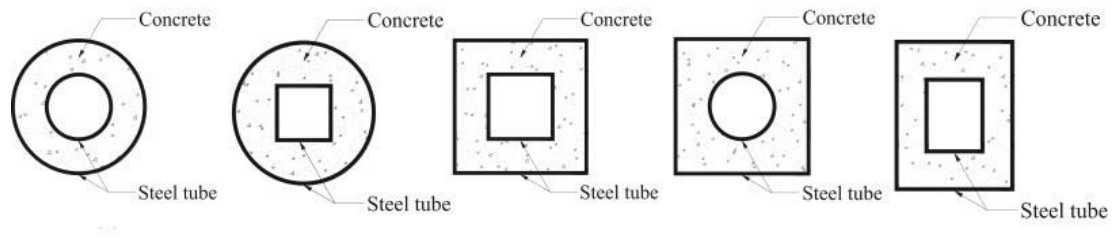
Concrete-filled double skin steel tubes (CFDSST)
